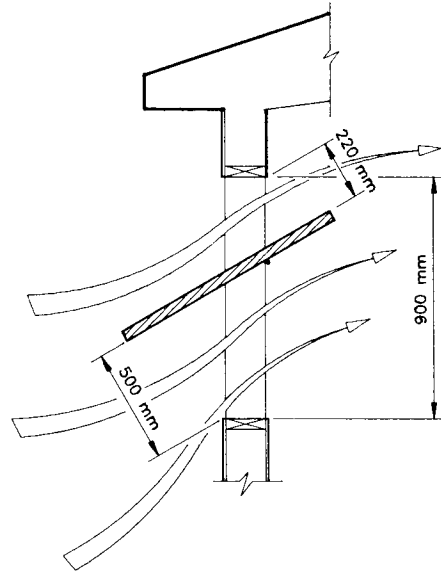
Rotating sidewall door for a naturally ventilated building in fully open position.
